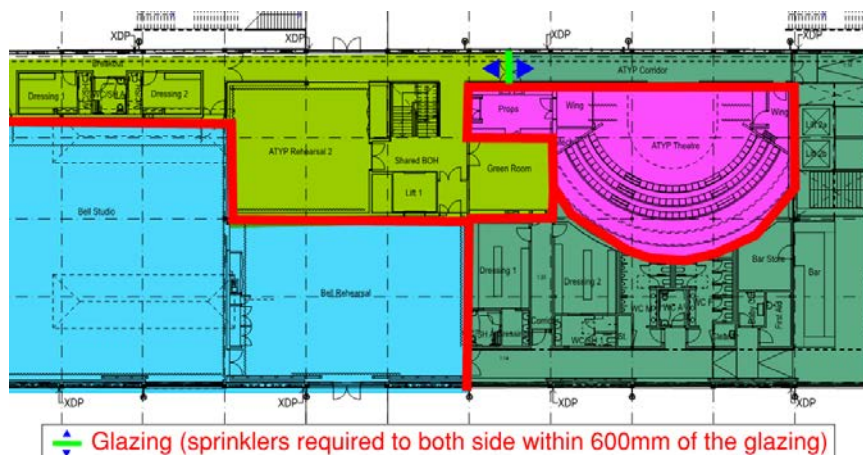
Level 1 and 2 - Glazed wall and doors separating ATYP corridor and SDC
